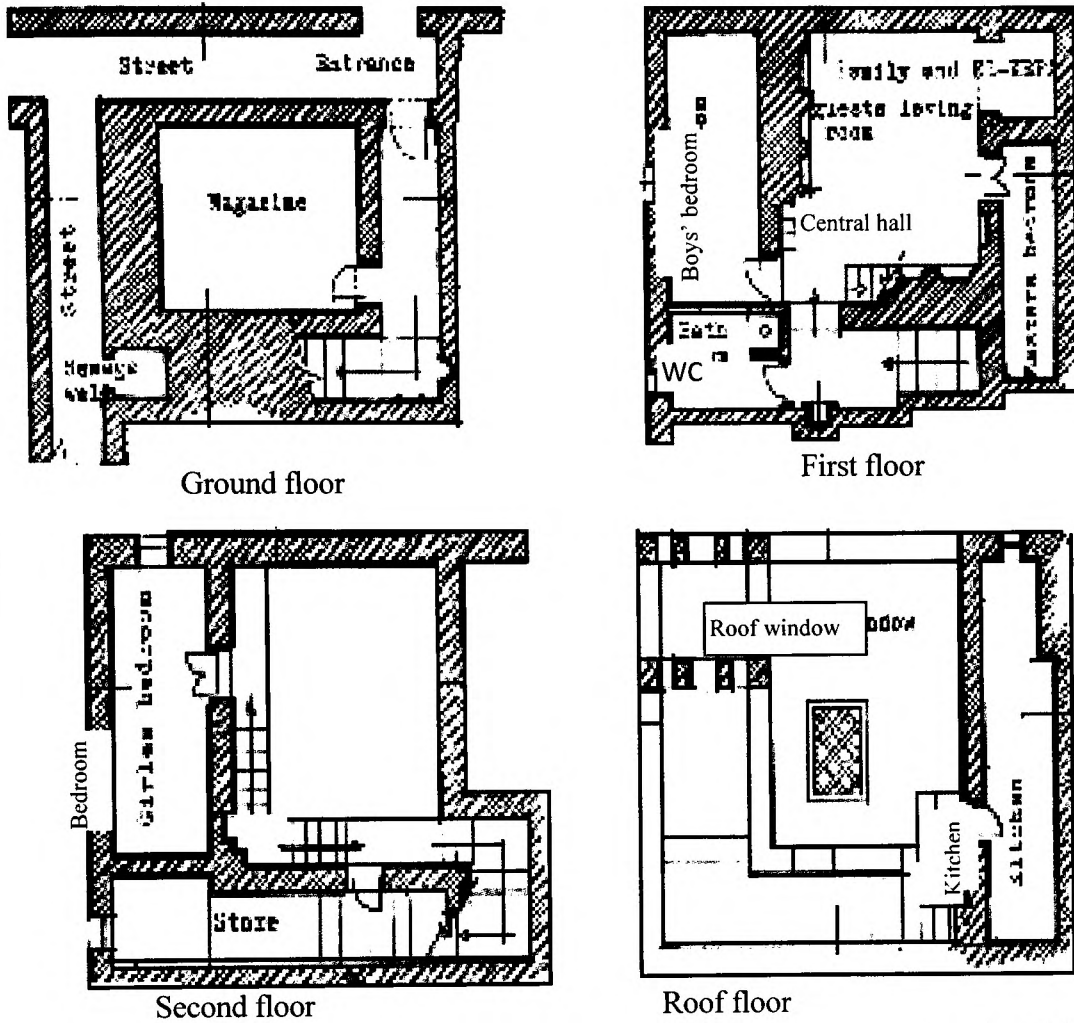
19: Plans of a typical house in Ghadames. Source: Ahmed (1985)
